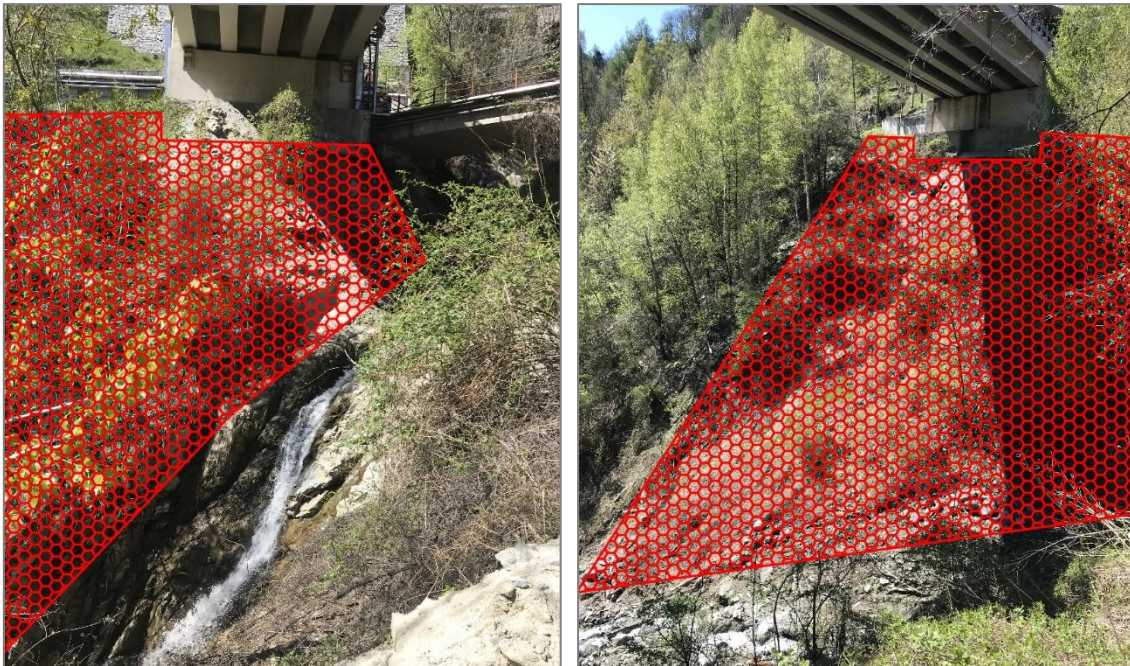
Areas of Intervention. Abutment A (left) and Abutment B (right)
